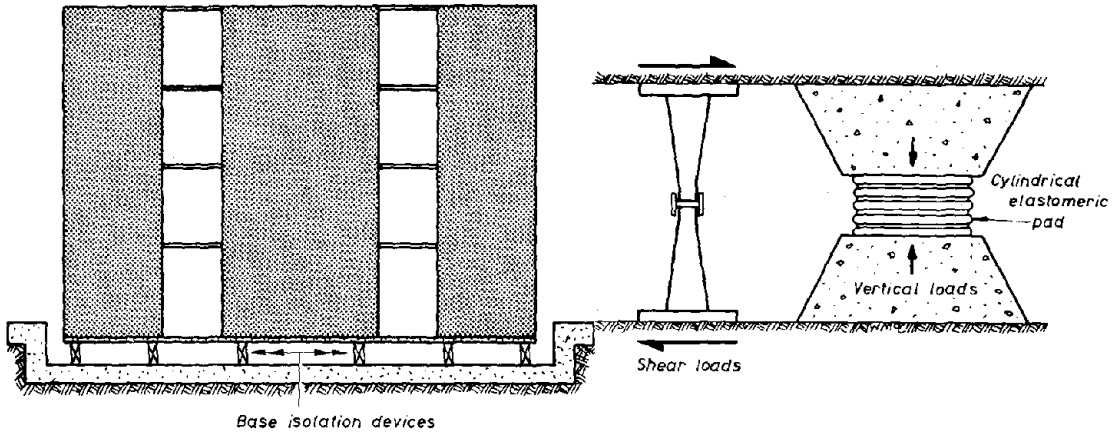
BASE ISOLATION FOR MASONRY BUILDINGS
